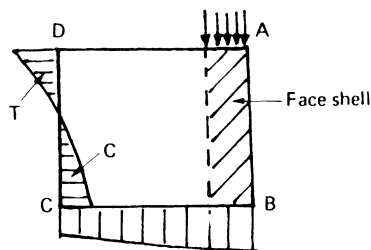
Failure of face-shell bedded masonry; quarter section of block (Shrive)
